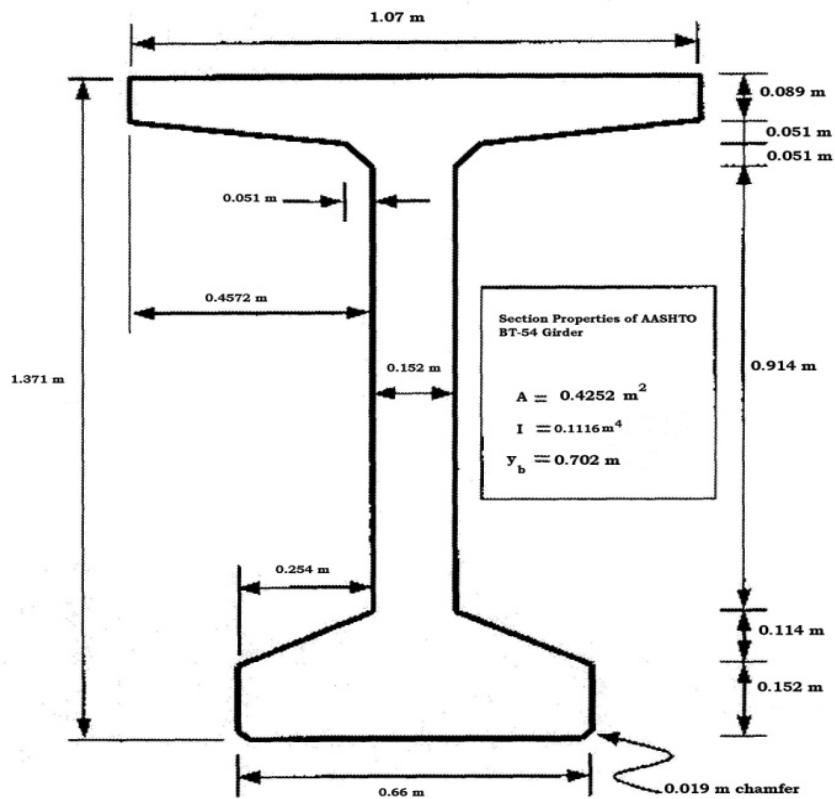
Cross-sectional properties of the AASHTO BT-54 girders.
